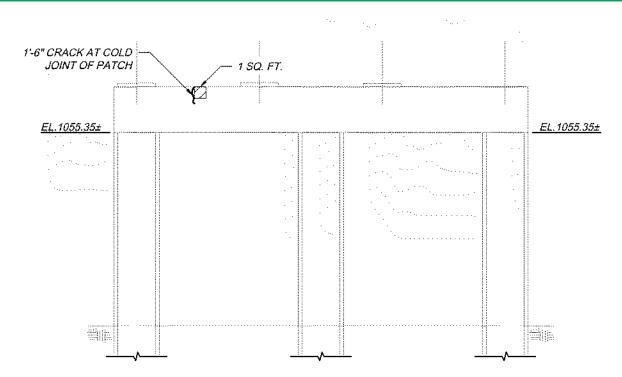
Location of Proposed Concrete Repairs - Pier 1 Upstation (South) Face Elevation MP 182.1
